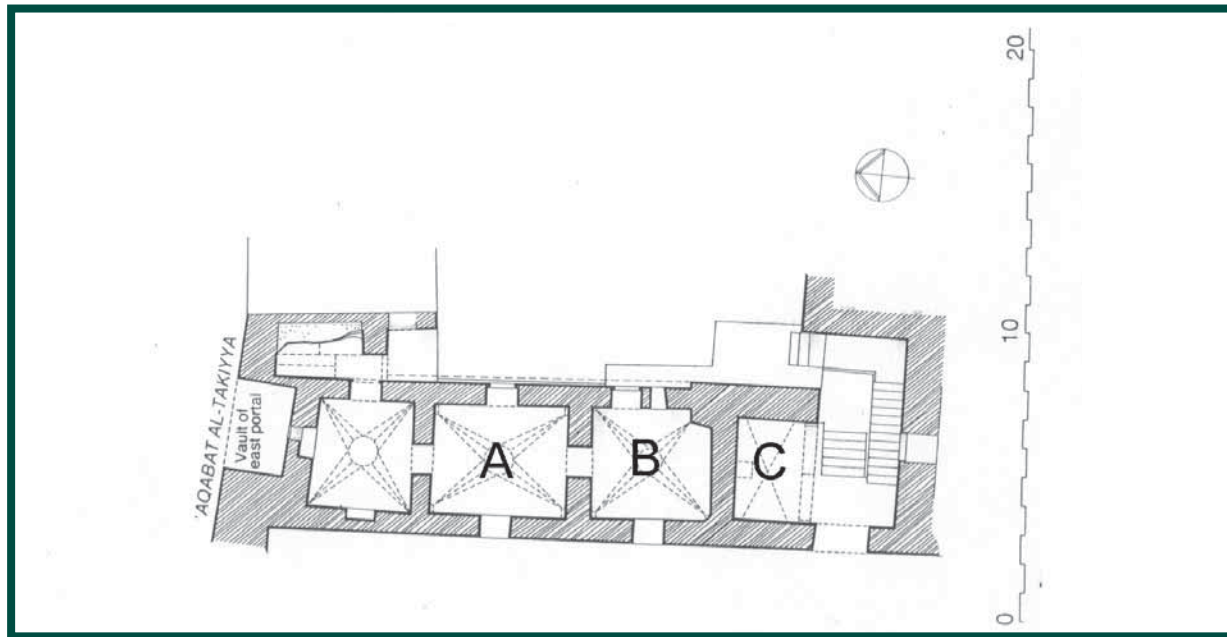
Plan of Mezzanine floor of Dar al-Sit Tunshuq al-Muzafariyya
